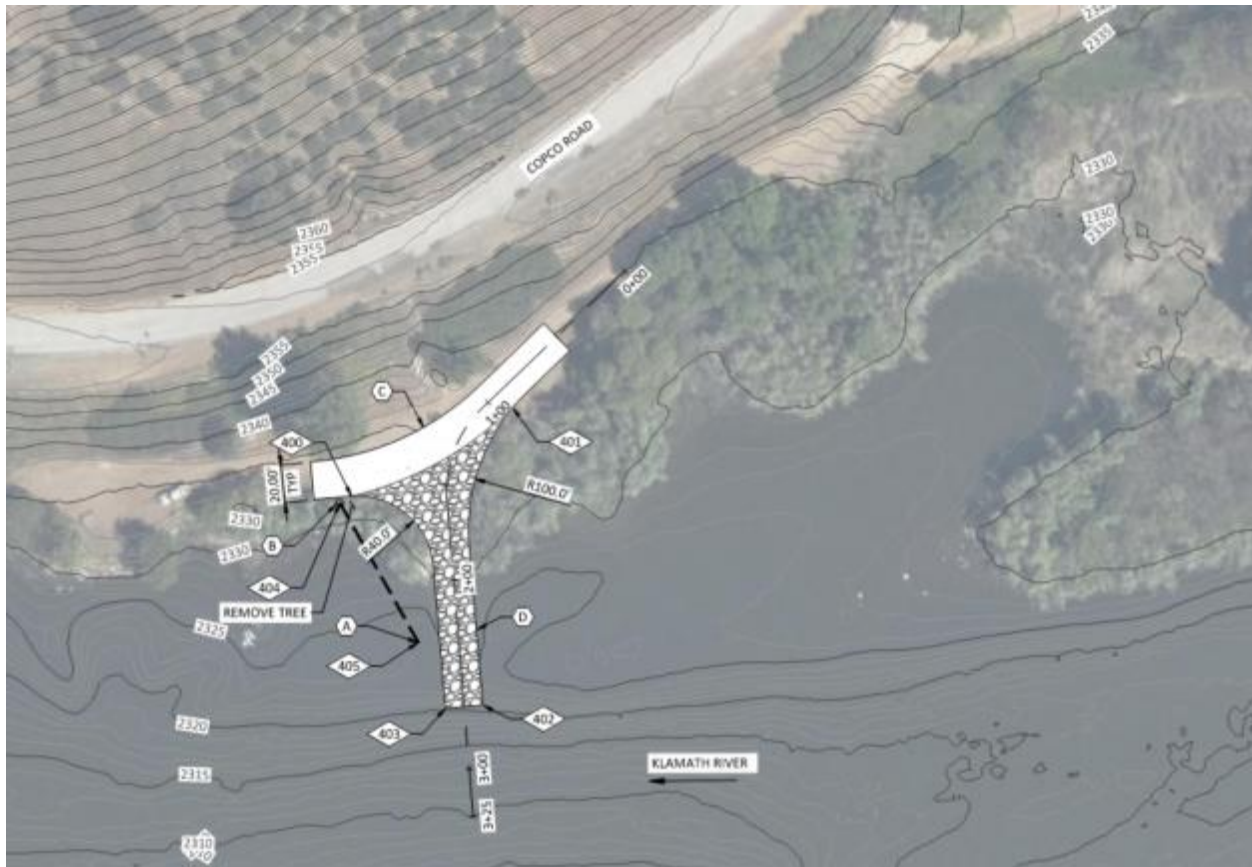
Fall Creek Confluence Fire Access Boat Ramp and Dry Hydrant
